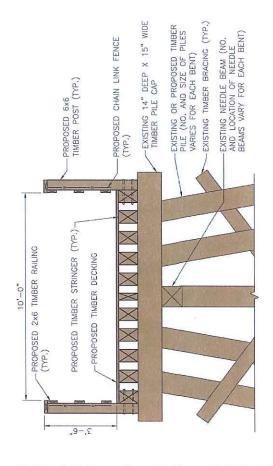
Alternative 1 – Rehabilitation of Existing Bridge Structure Cross Section
